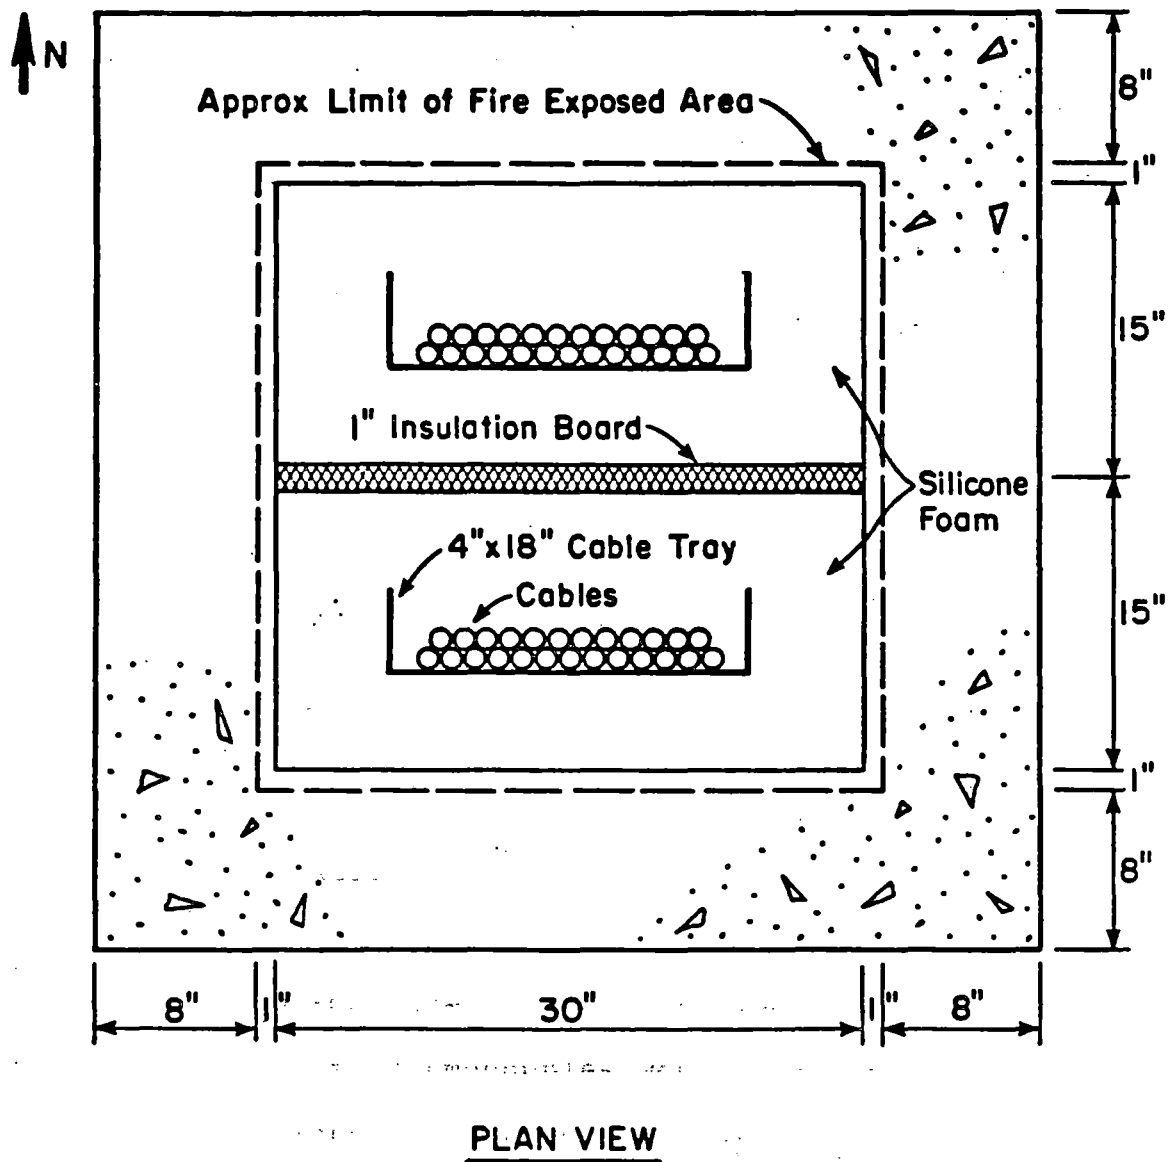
LAYOUT OF CONCRETE SLAB WITH TWO SILICONE FOAM SEALS AND PENETRATING CABLE TRAY ASSEMBLIES
